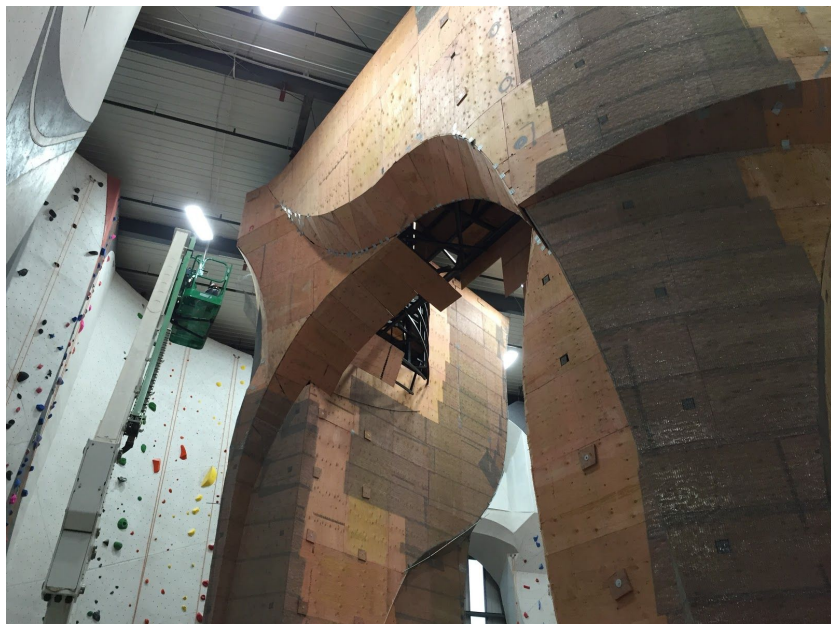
The frame of a climbing wall, almost prepped for concrete cover
